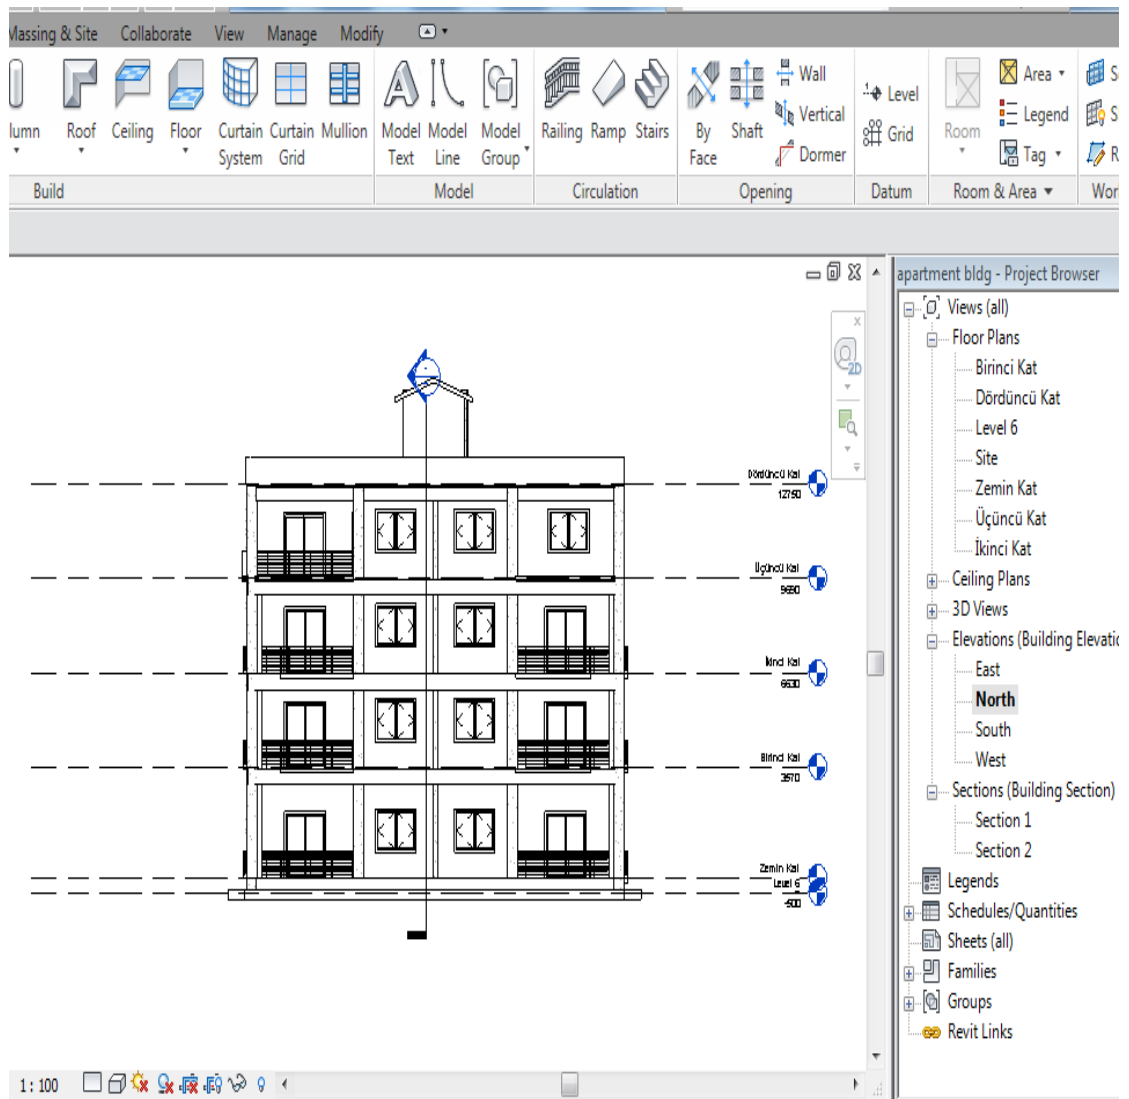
North side view of apartment building in Autodesk Revit Architecture
